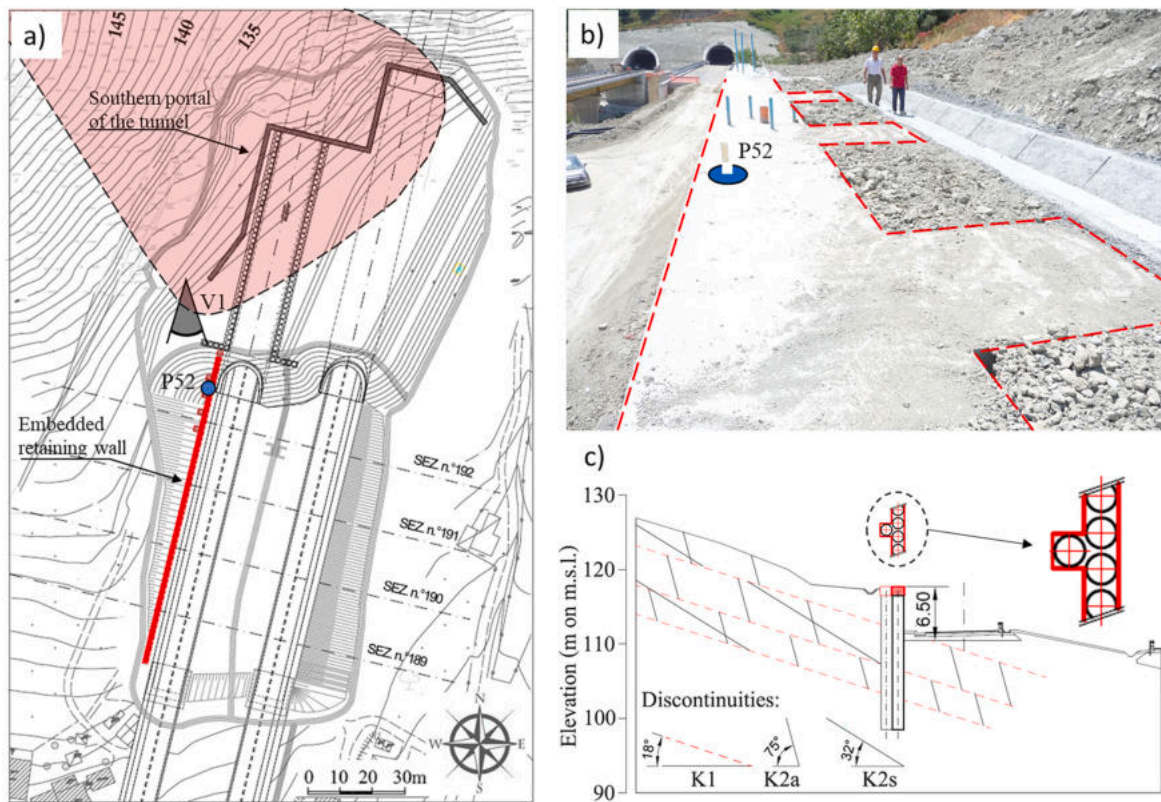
a) Plan view of the construction site with location of the retaining wall; b) Photo taken soon after construction of the wall, with indication of the inclinometer P52; c) Cross-section n.192 of the wall, with indication of the most relevant discontinuities affecting the slope.
